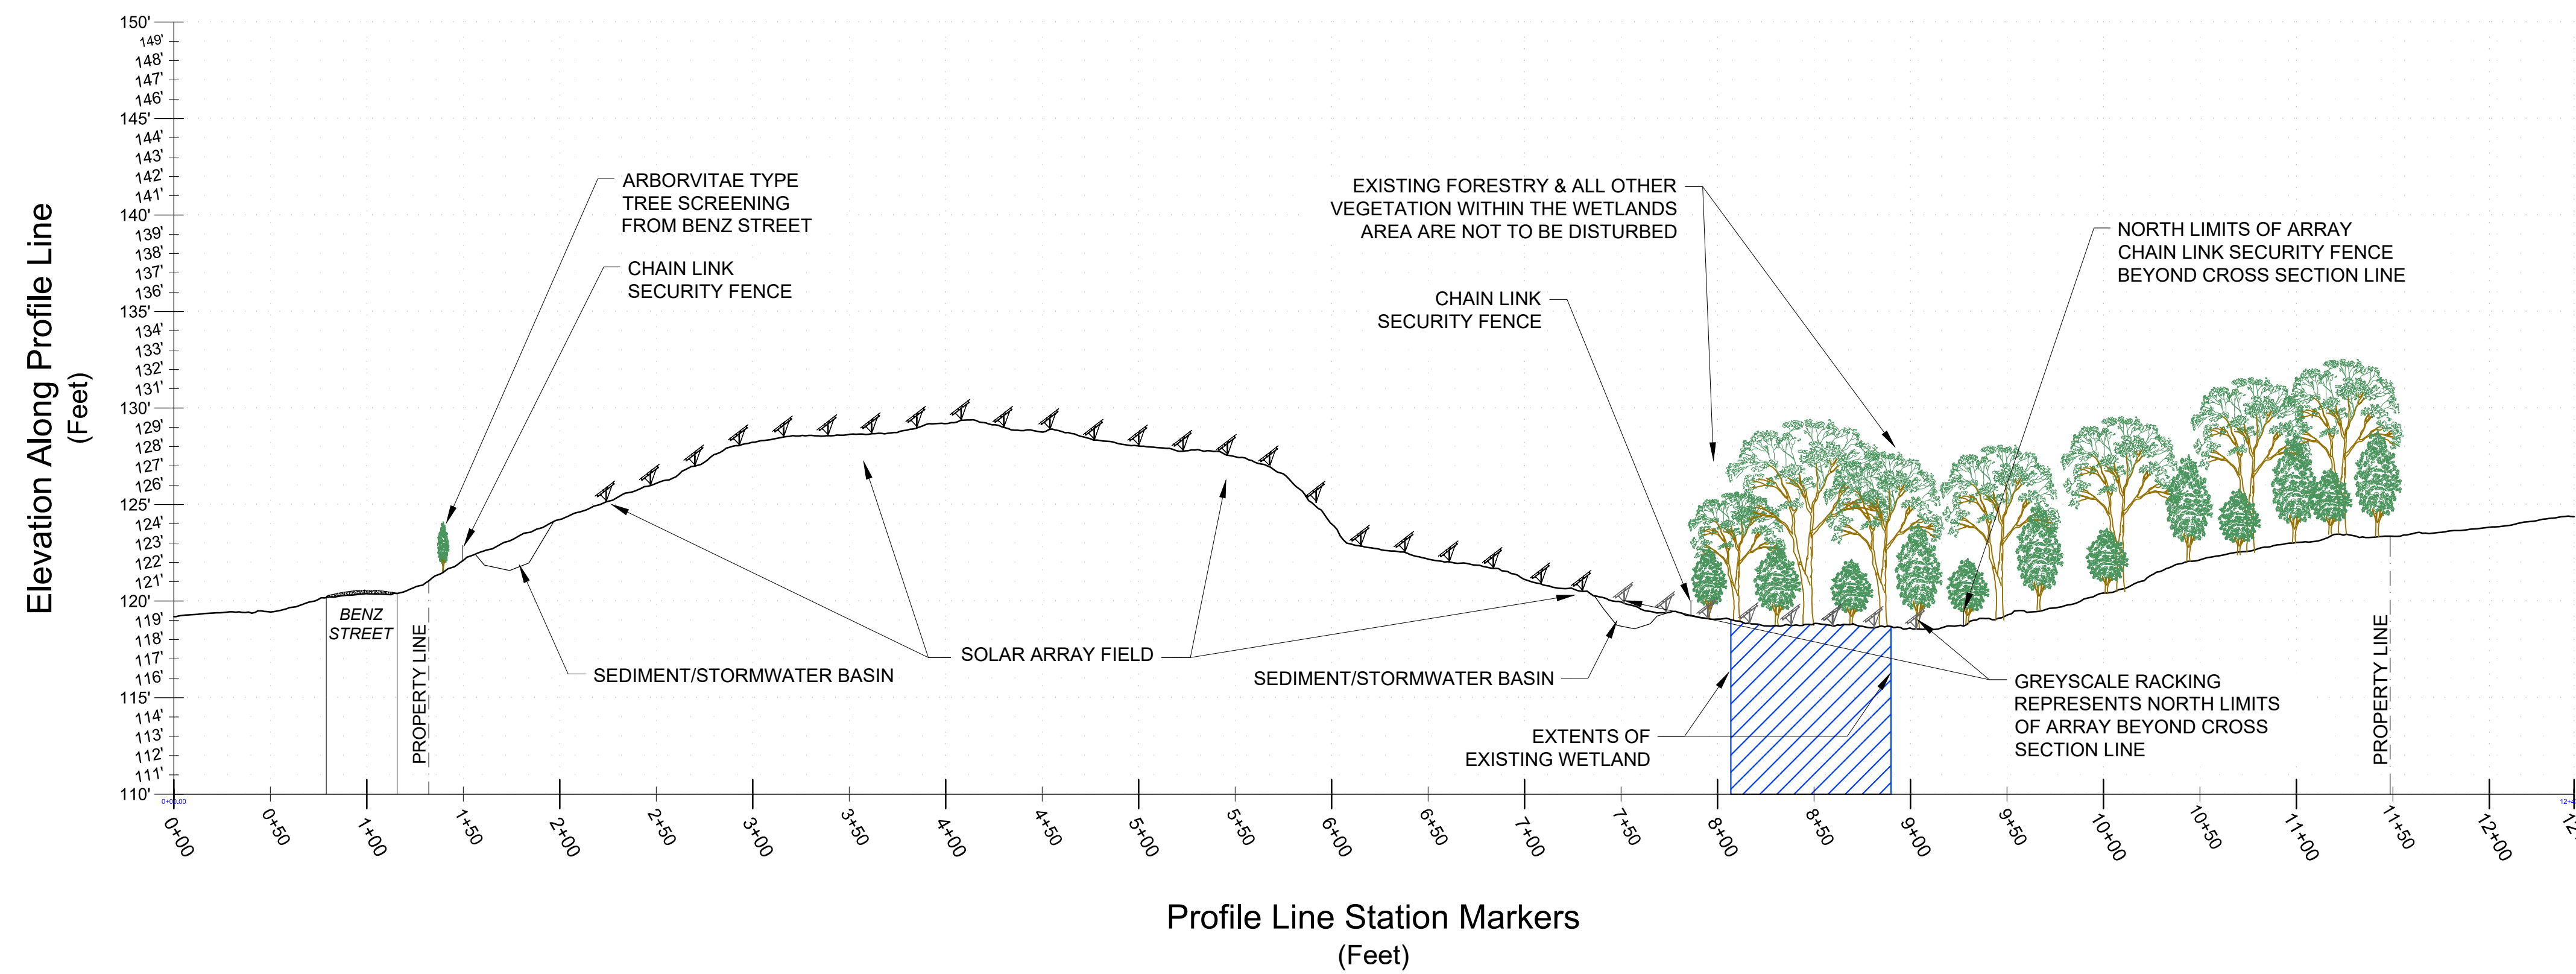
EXHIBIT B: PROJECT CROSS SECTION (SOUTHERN SITE VIEW)
